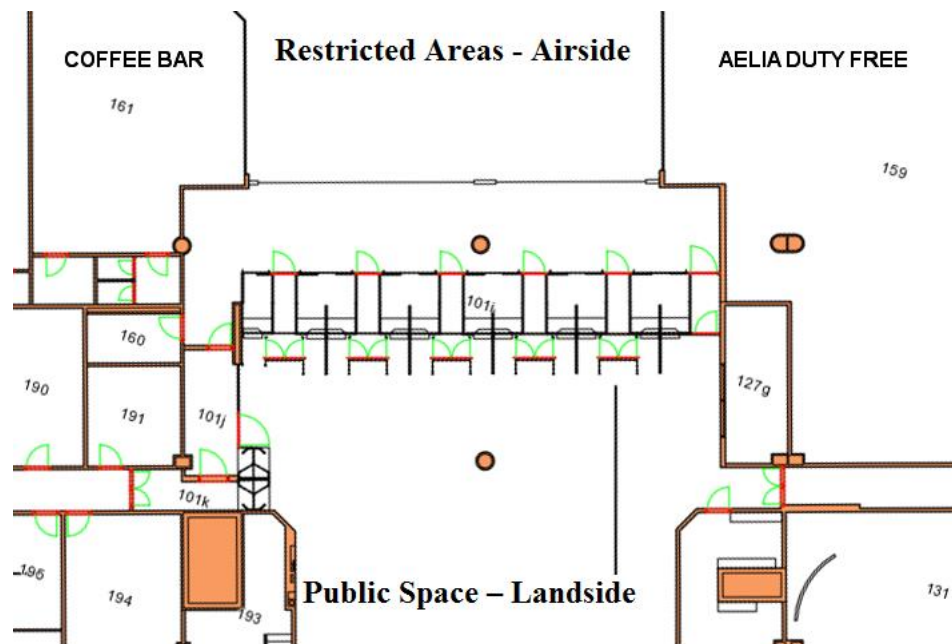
Ground plan current passport control in the departure hall of Terminal 1
